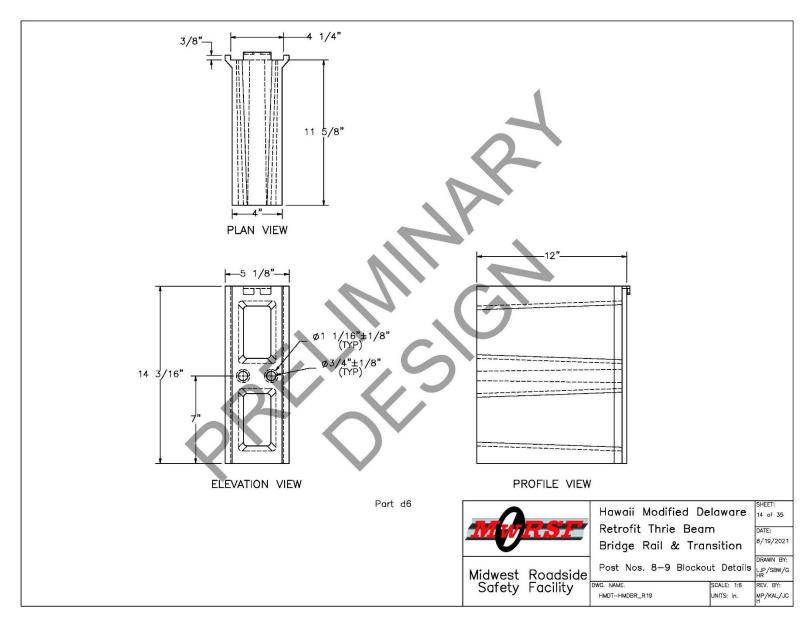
Post Nos. 8 and 9 Blockout Details, Test No. HMDT-1
